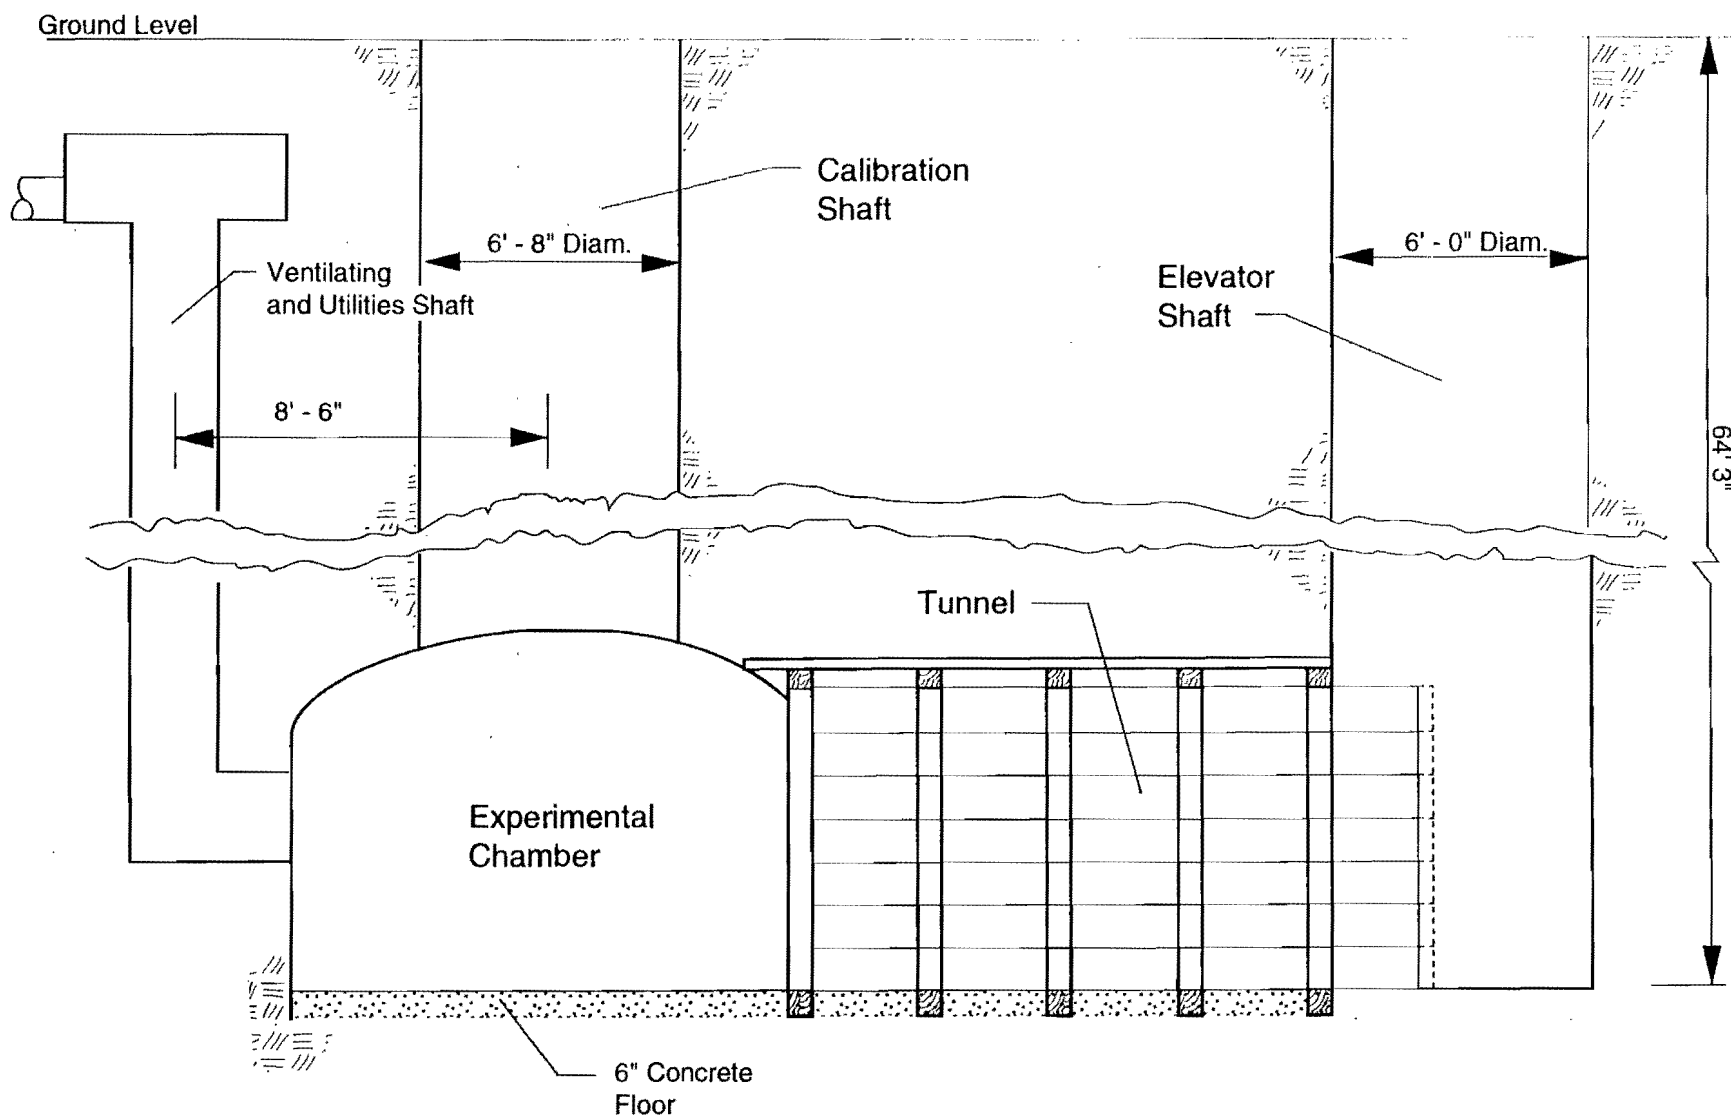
Cross section through the Area 10 shafts. [Adapted from unpublished engineering drawings.]
